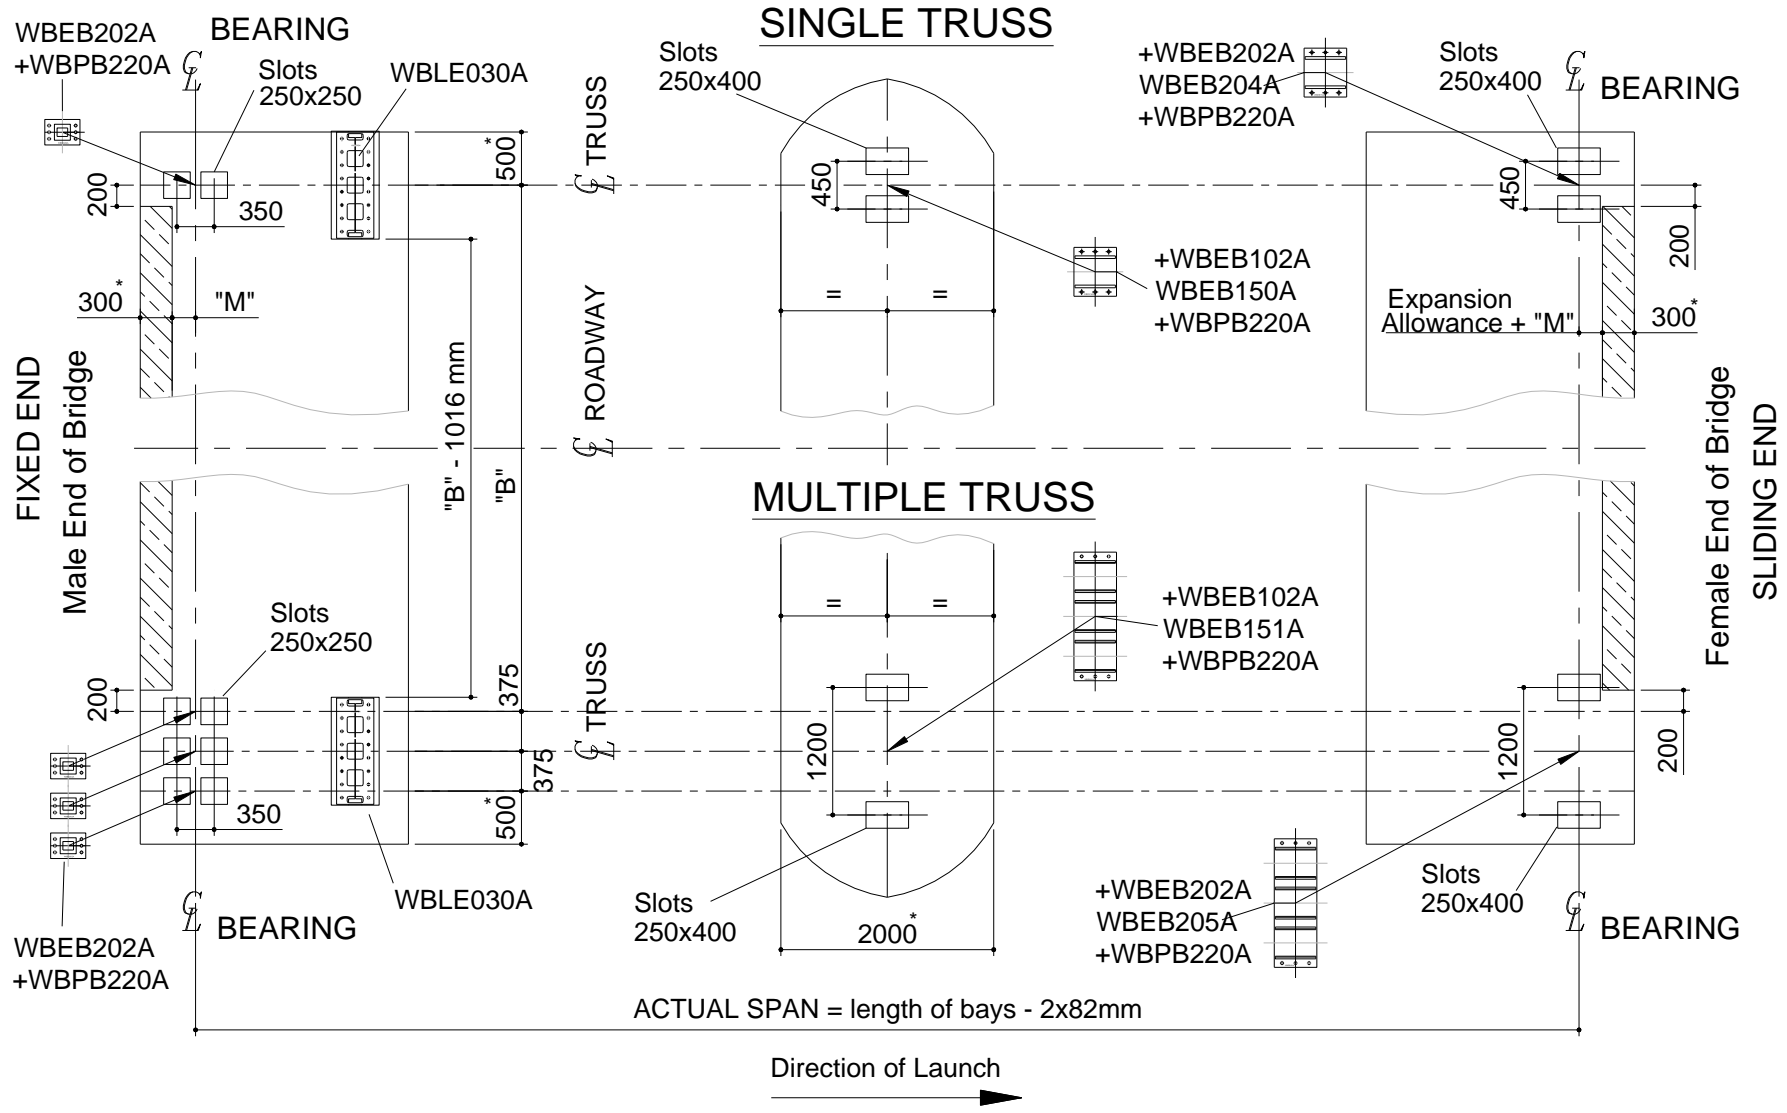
12- ABUTMENT, BEARING PLATES AND ROLLER LAYOUT FOR SPAN JUNCTION BRIDGES – TOP VIEW
